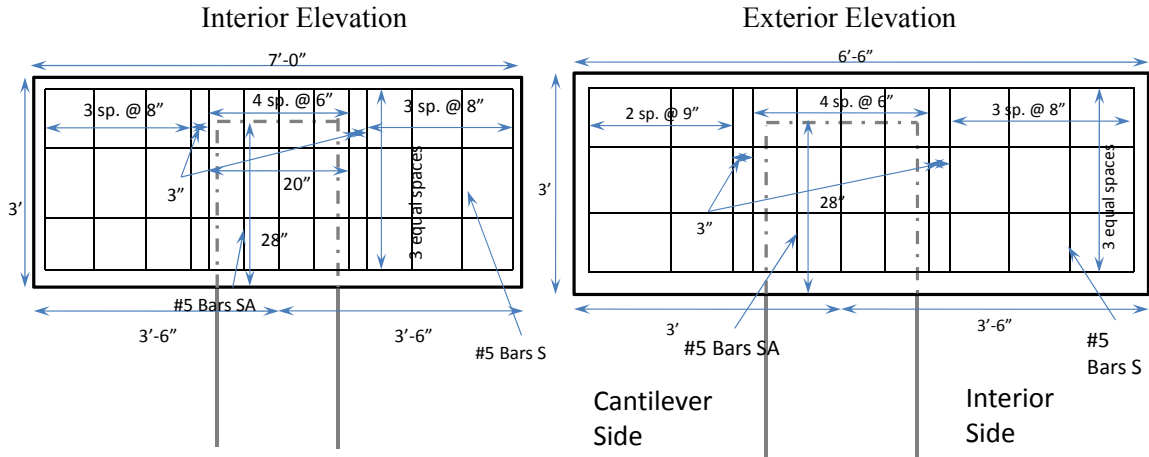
Reinforcement Pattern (24 inch Square Pile)
